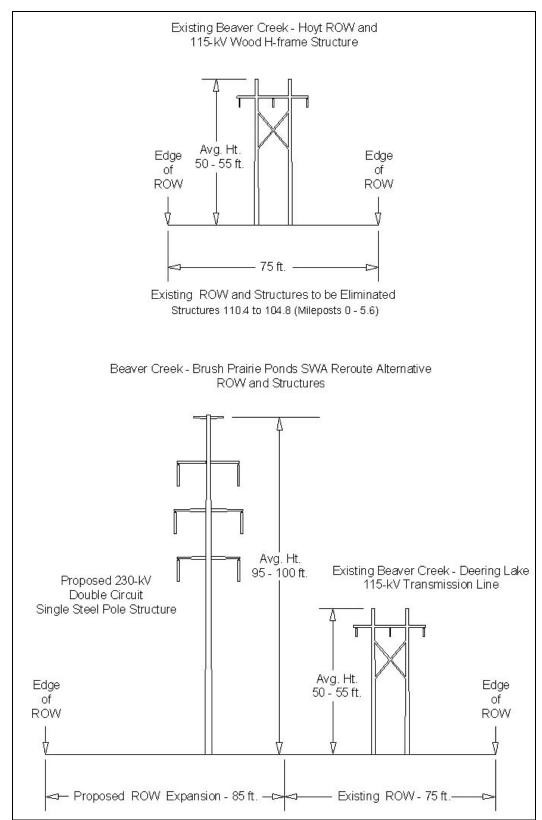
Beaver Creek-Brush Prairie Ponds SWA Reroute Alternative Existing and Alternative ROWs and Structures
